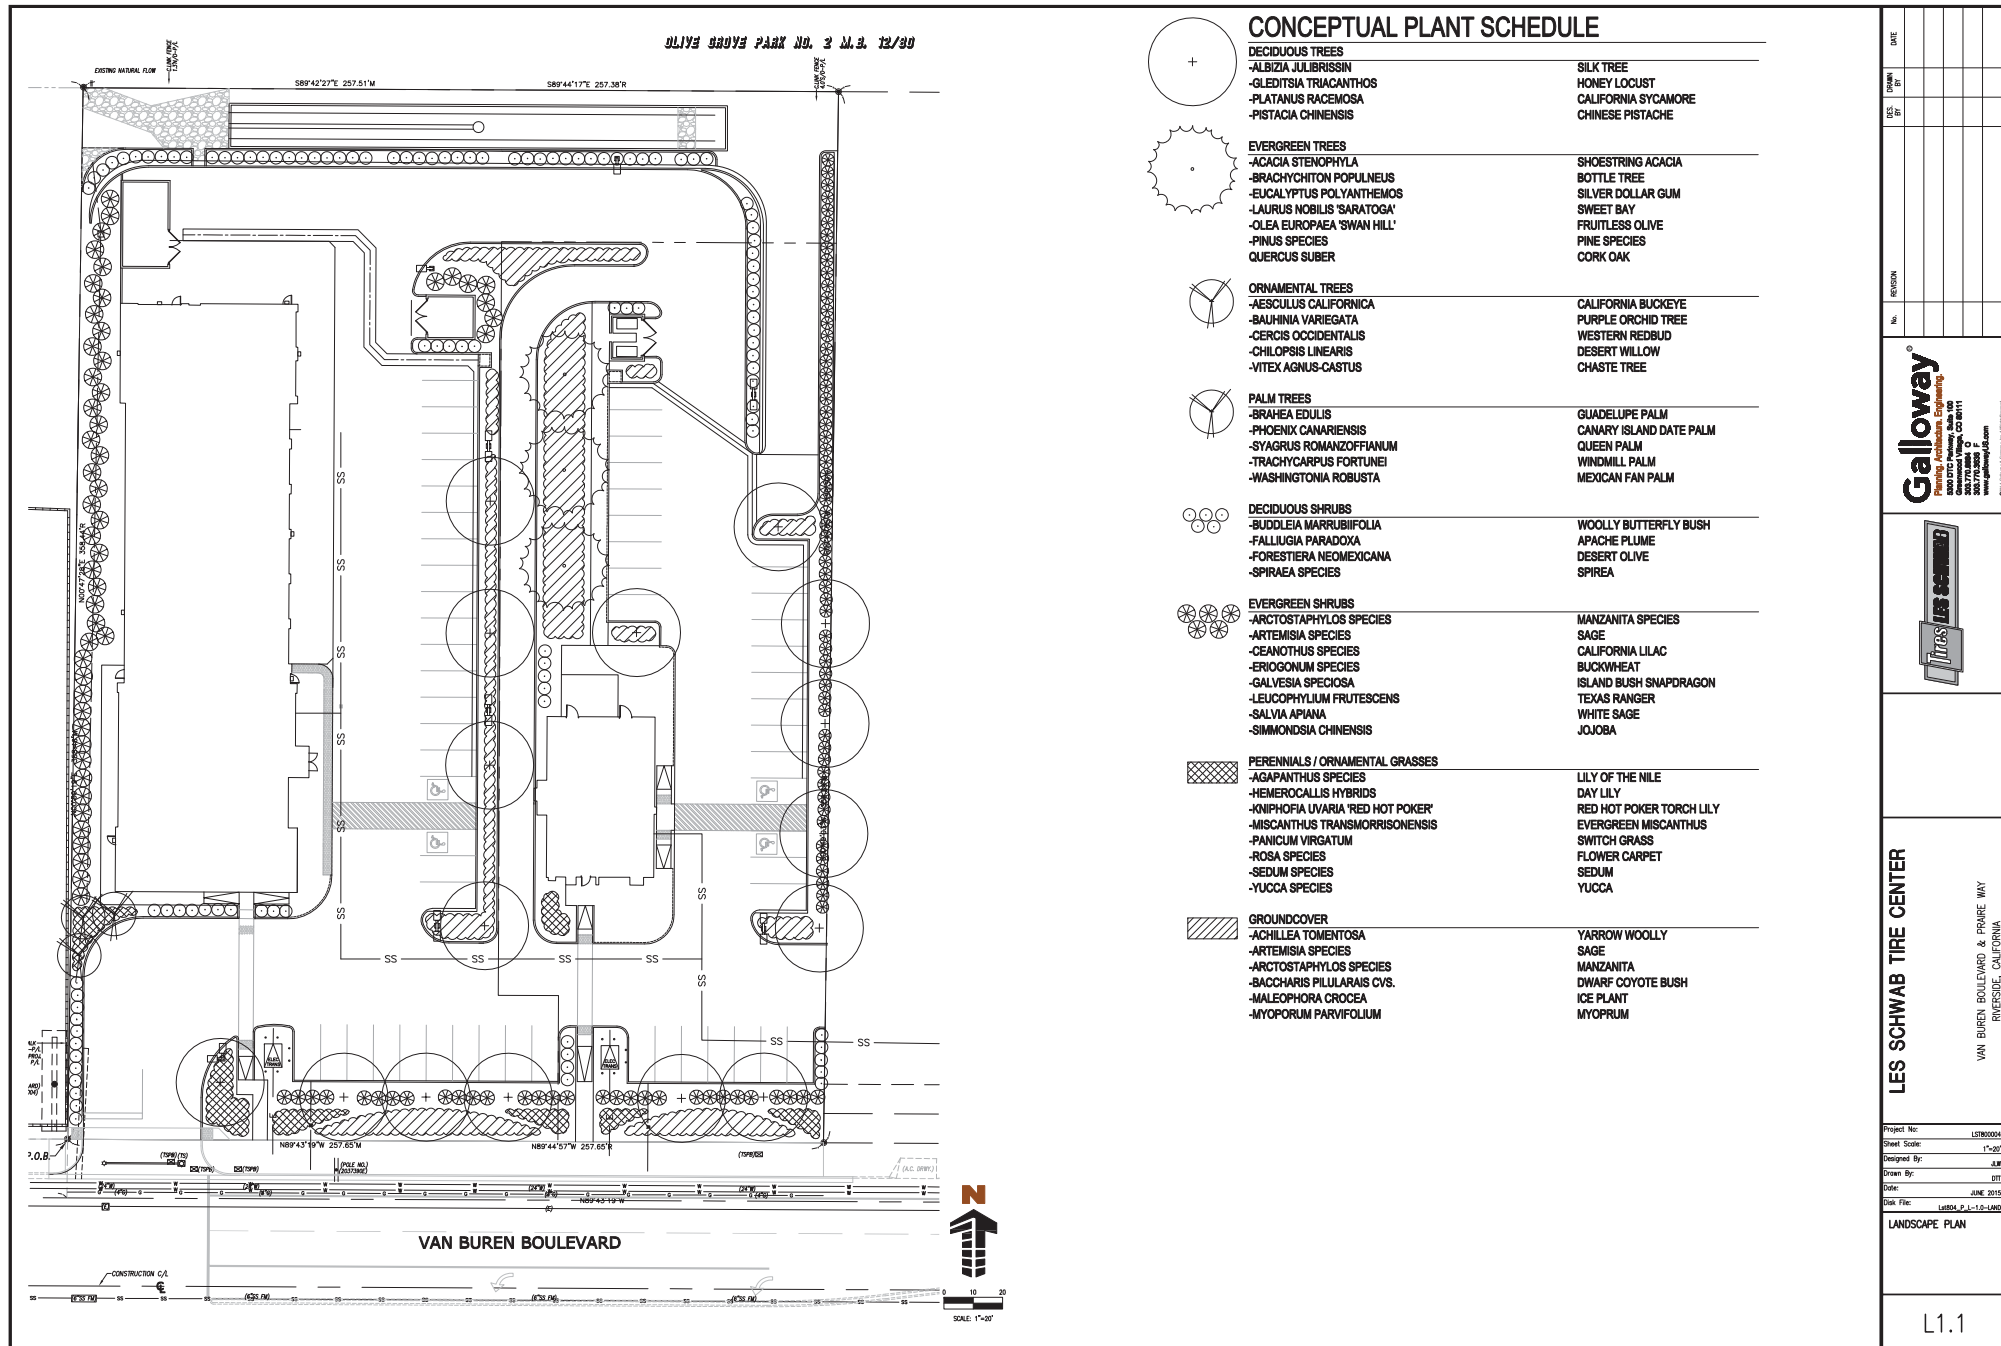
P15-0075, P15-0076 & P15-0819, Conceptual Landscape Plan
